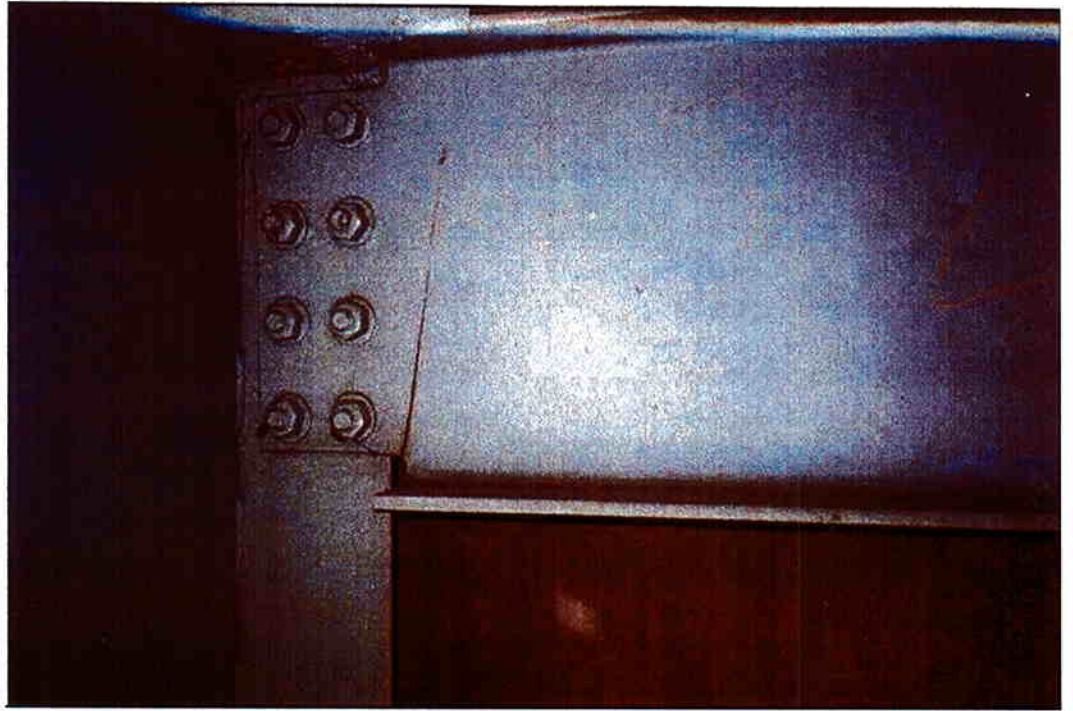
Looking south at diaphragm between girders 4 and 5 at the lower deck south abutment. Note 13 inch crack in diaphragm web.
